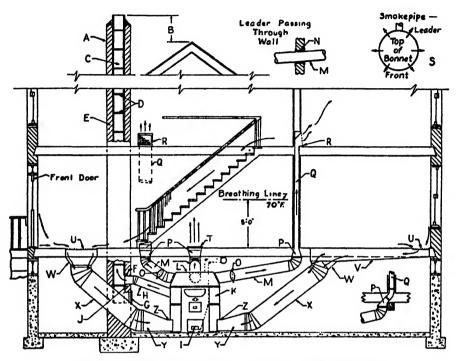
A SECTIONAL VIEW OF A TYPICAL PLANT SHOWING GOOD INSTALLATION PRACTICES
